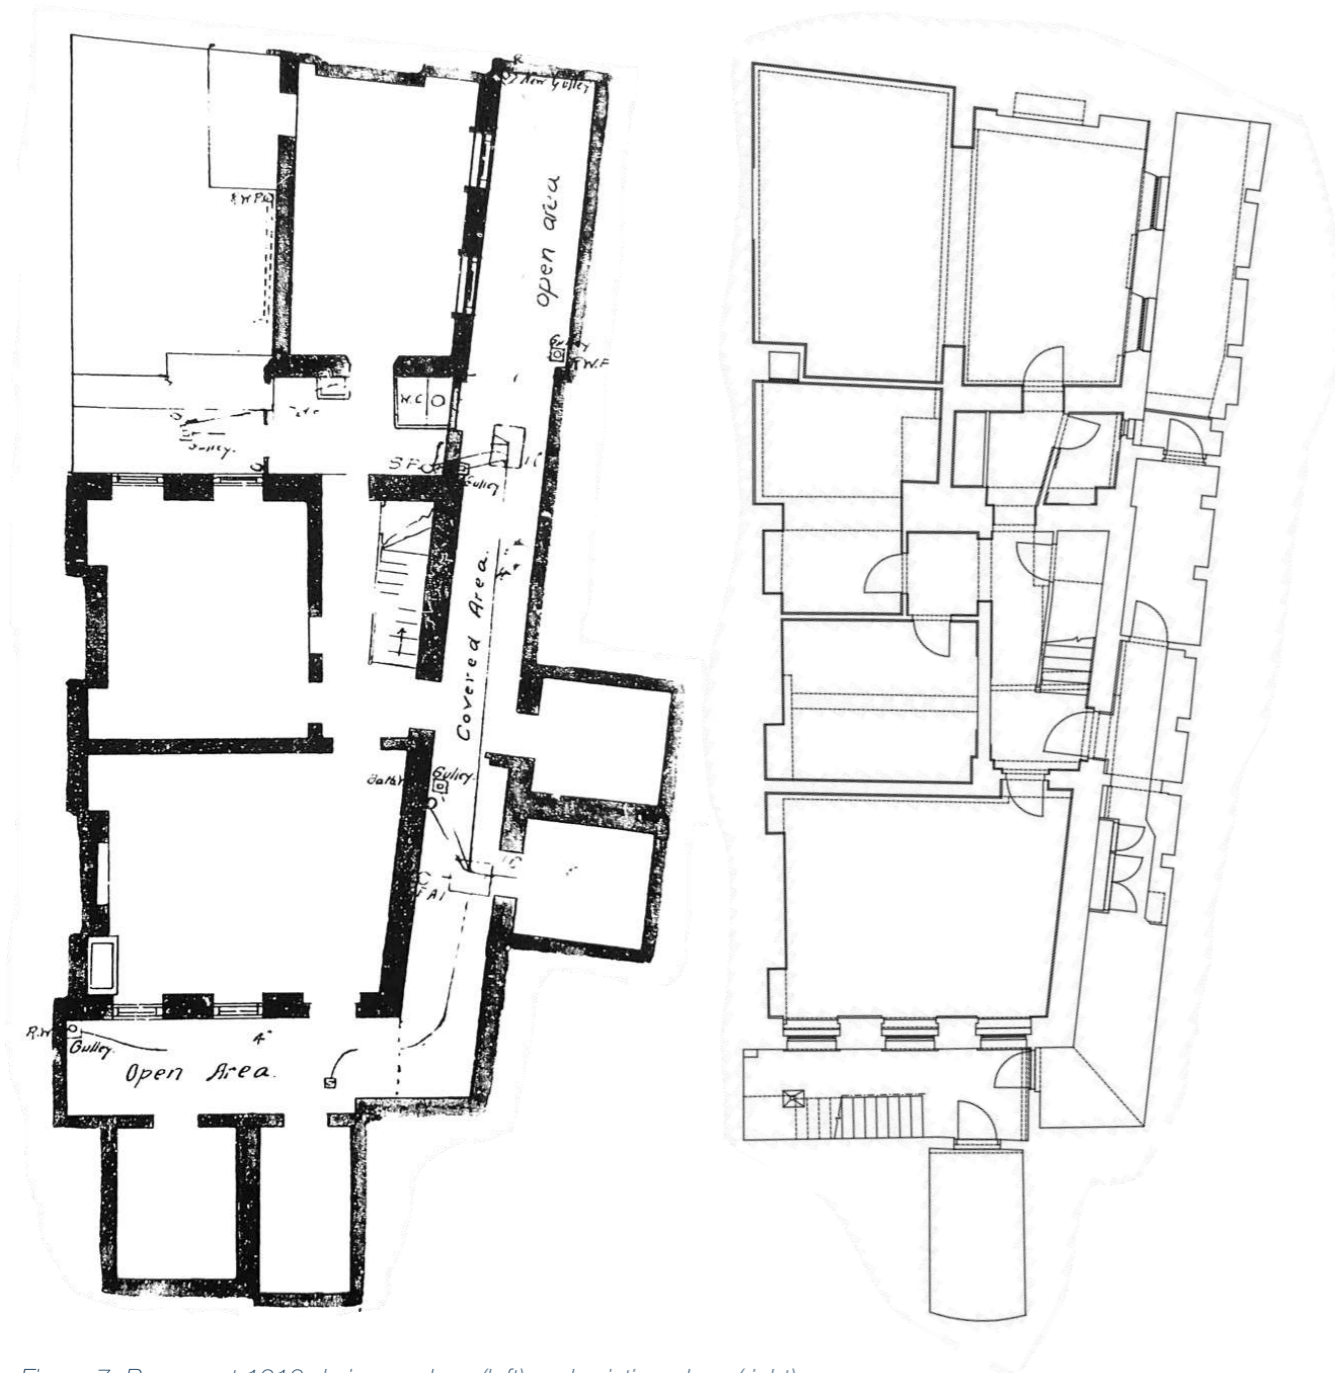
Basement, 1913 drainage plans (left) and existing plans (right).
